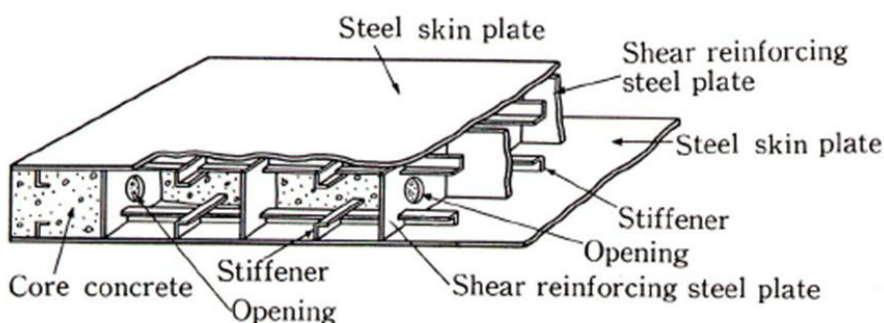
Steel-concrete sandwich slab (JSCE 2006 [1])
